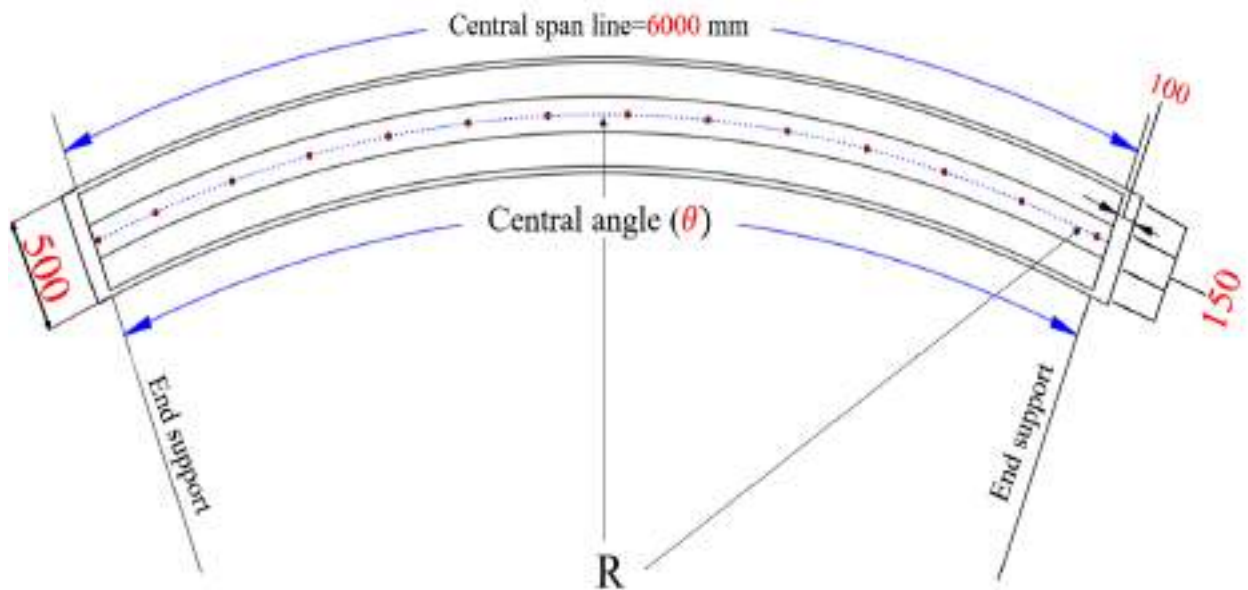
Plan view for the curved composite steel-concrete beam (unit: mm).
